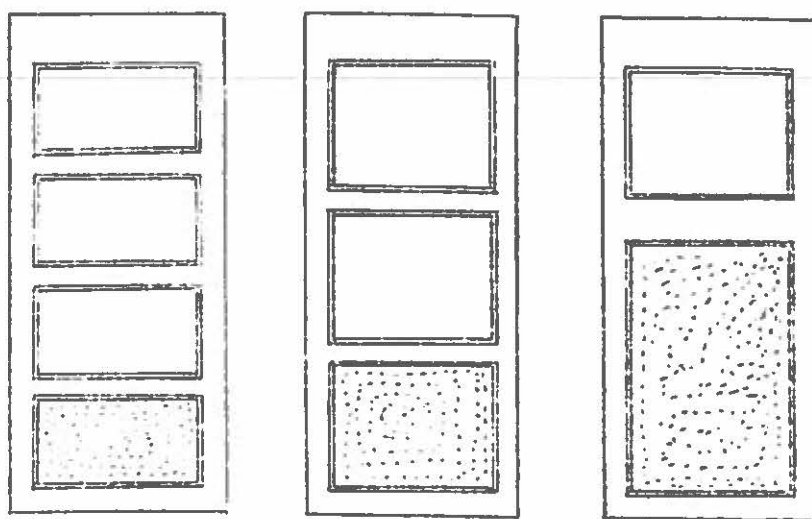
STANDARD WOOD PANELL'D DOORS INTERIOR DOORS UNGLAZED
